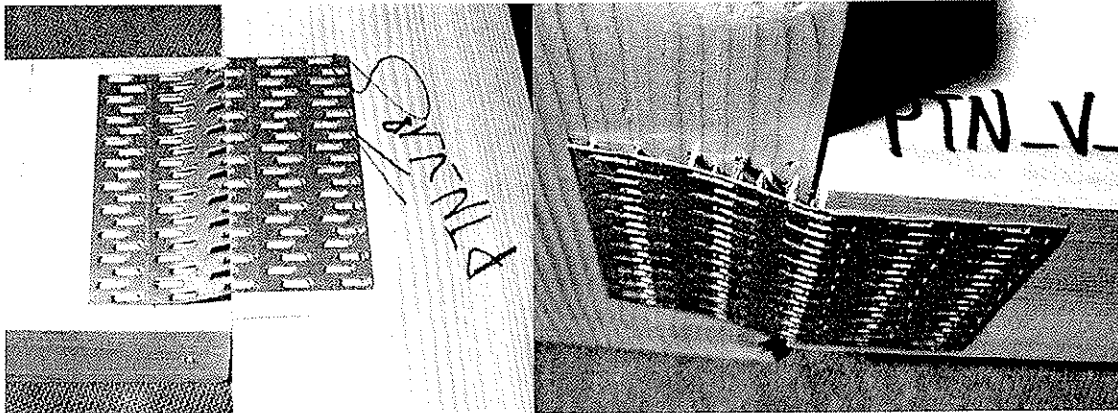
Truss plate deformation and subsequent withdrawal failure of nails close to the joint line.
